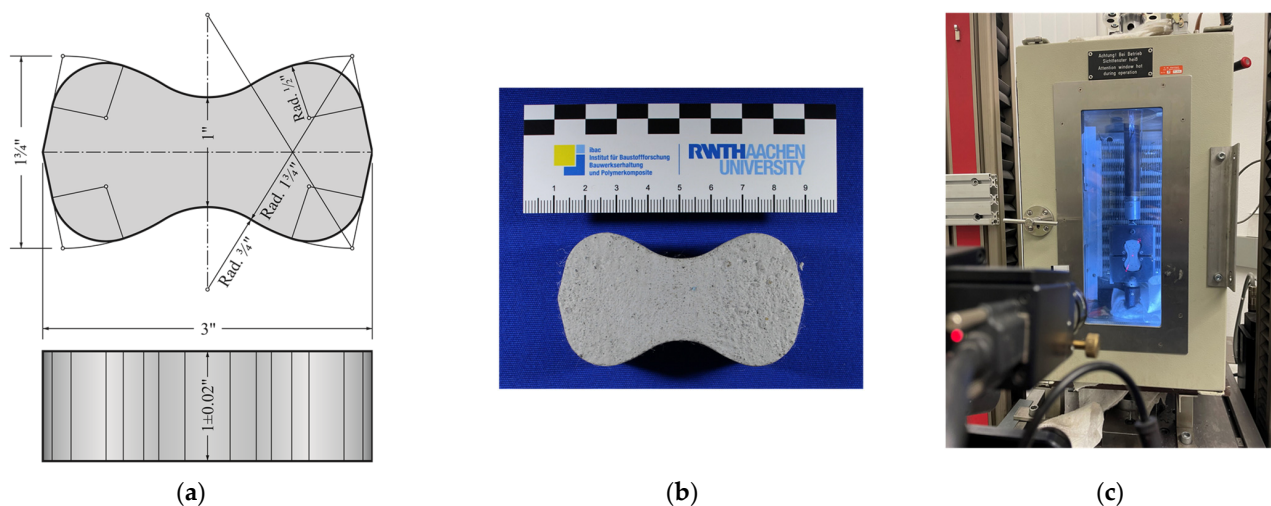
Tensile strength test setup adapted from [27,28]: (a) technical drawing of briquet specimen; (b) briquet specimen SRM-A4; (c) test setup in climatic chamber.
